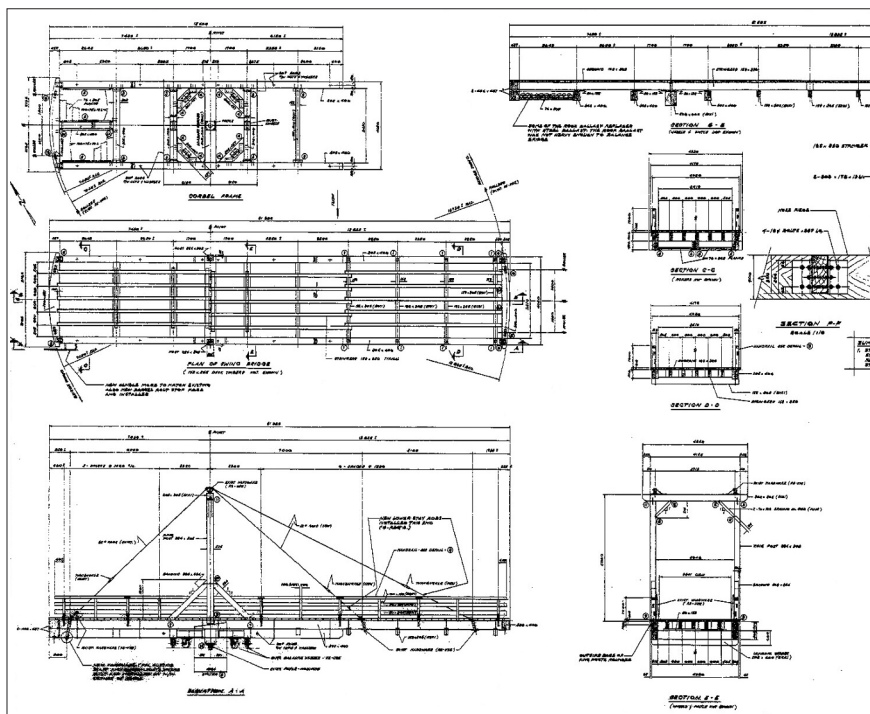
Drawing of the timber swing bridge as reconstructed by Parks Canada at Lower Brewer's in 1984. (Parks Canada, "Lower Brewers, New Bridge", detail of Drawing 10-891, Sheet 104, January 31, 1984)
